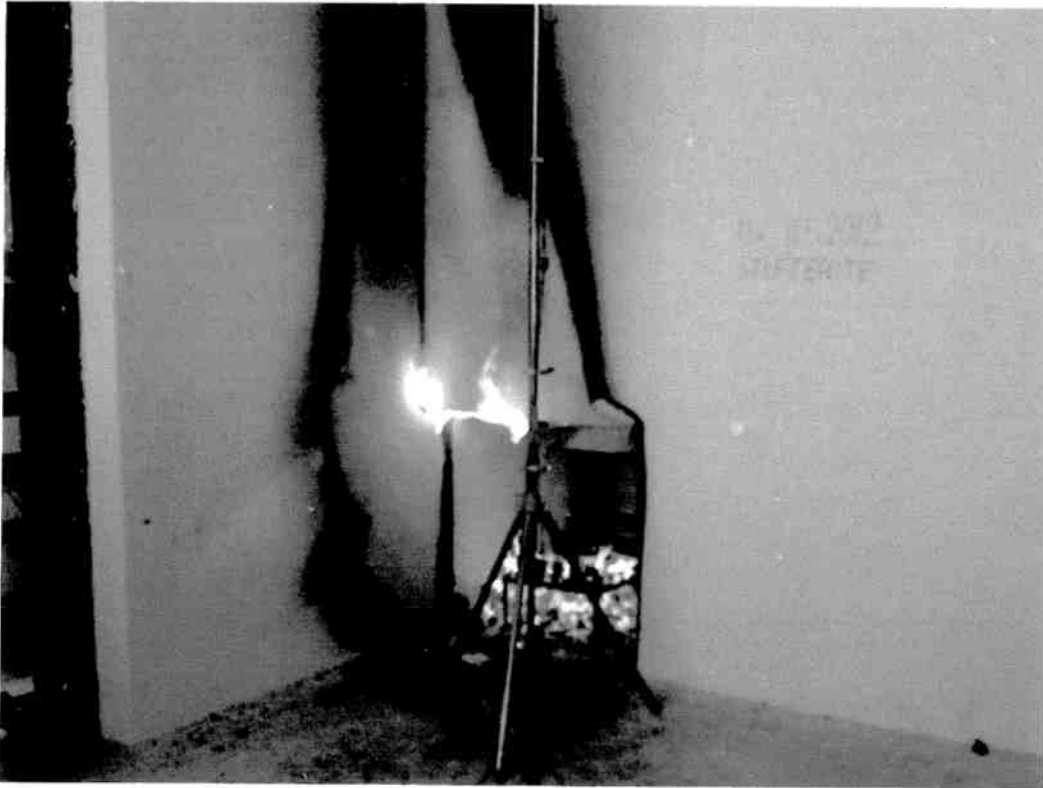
(P1060132): Test specimen during testing (18 minutes into test)
